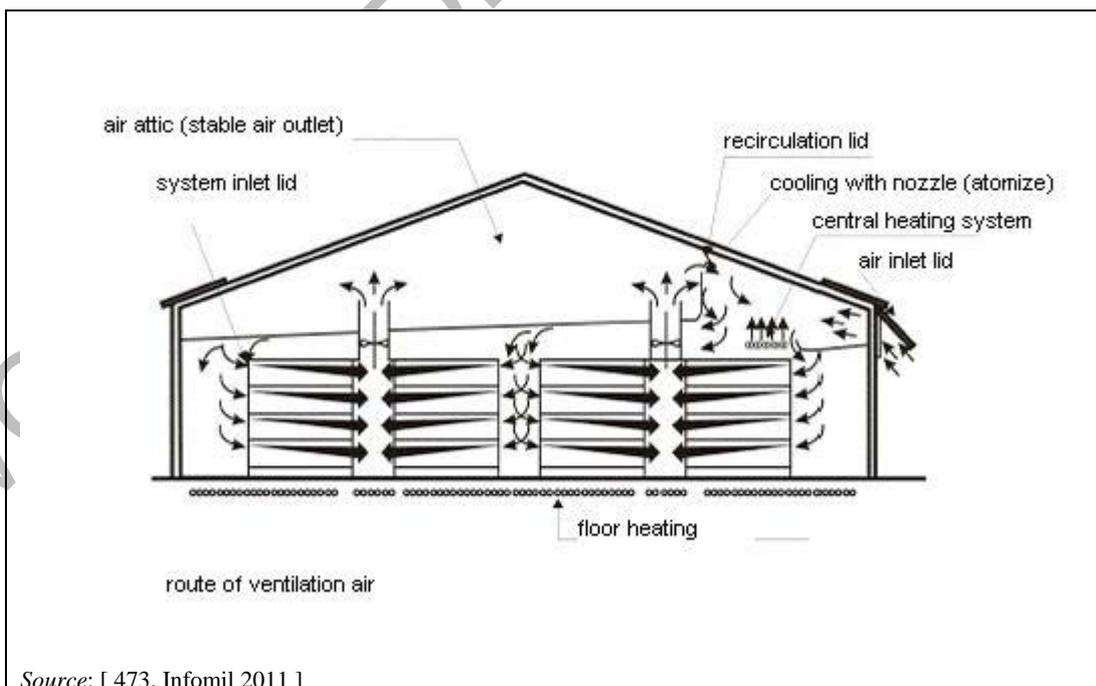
Schematic cross-section of a tiered floor system for broilers, with air flows
